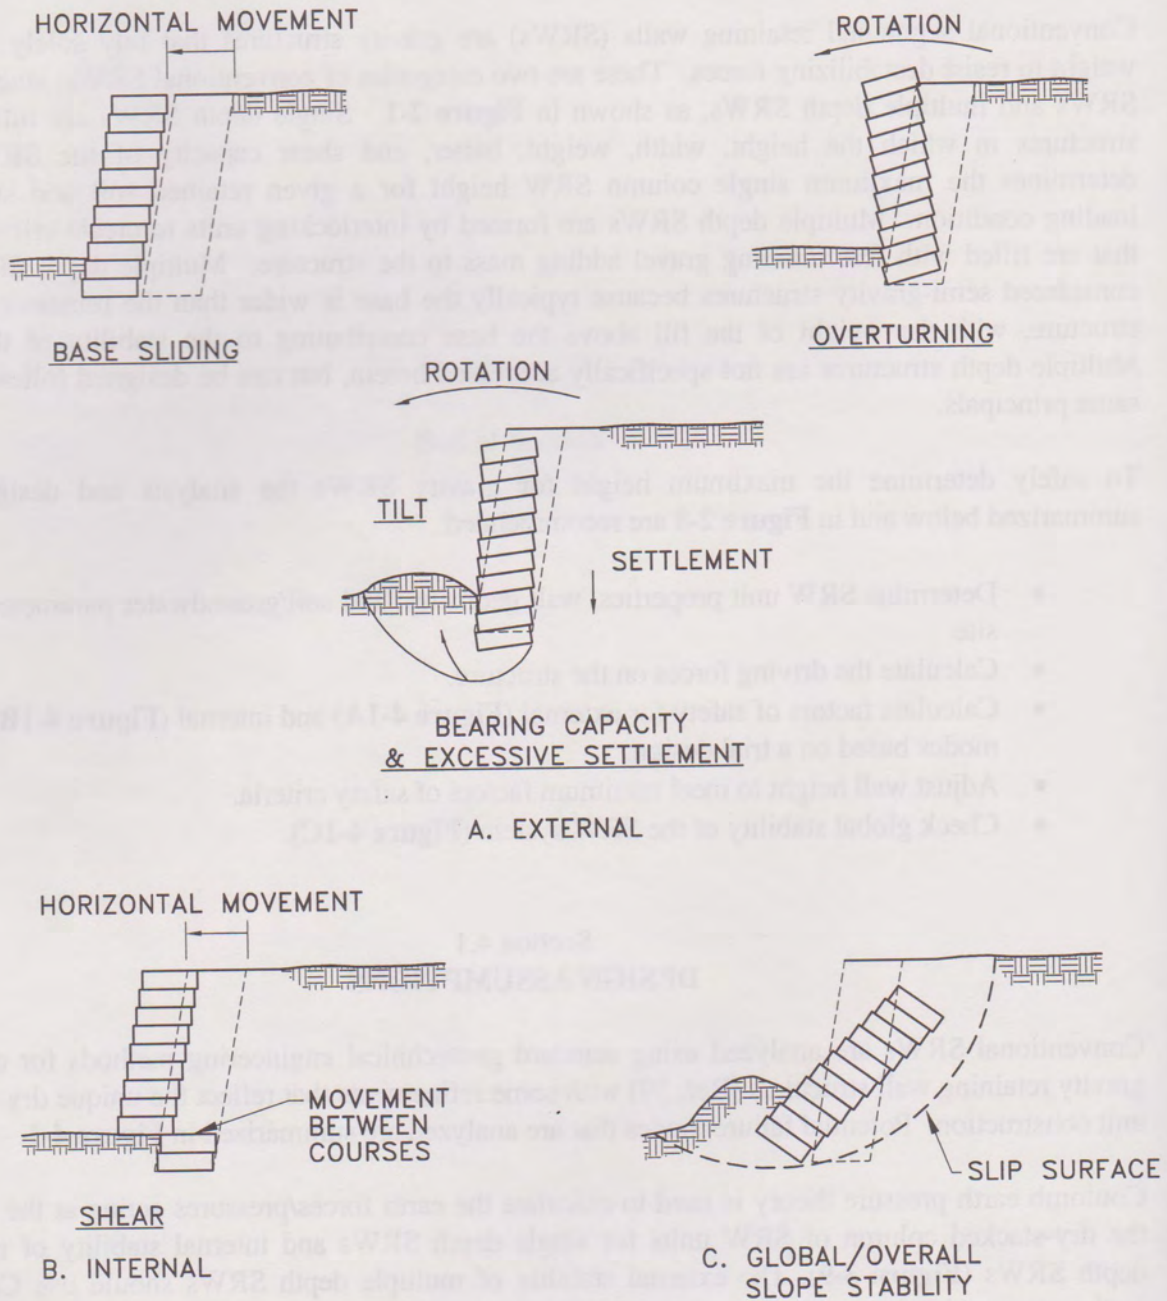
MAIN MODES OF FAILURE FOR CONVENTIONAL SRWs
